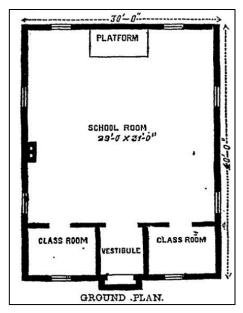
Prospective one-room schoolhouse floorplan (*The Canada Farmer*, Vol. 3, no. 12, p.189)
